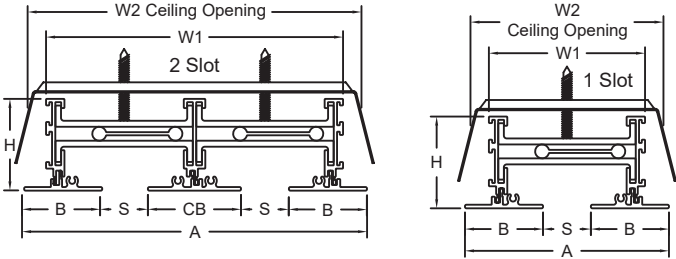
(Step 2B): LAD-CM Cut Section (-AA shown) Sub Frame Installed in Framing
